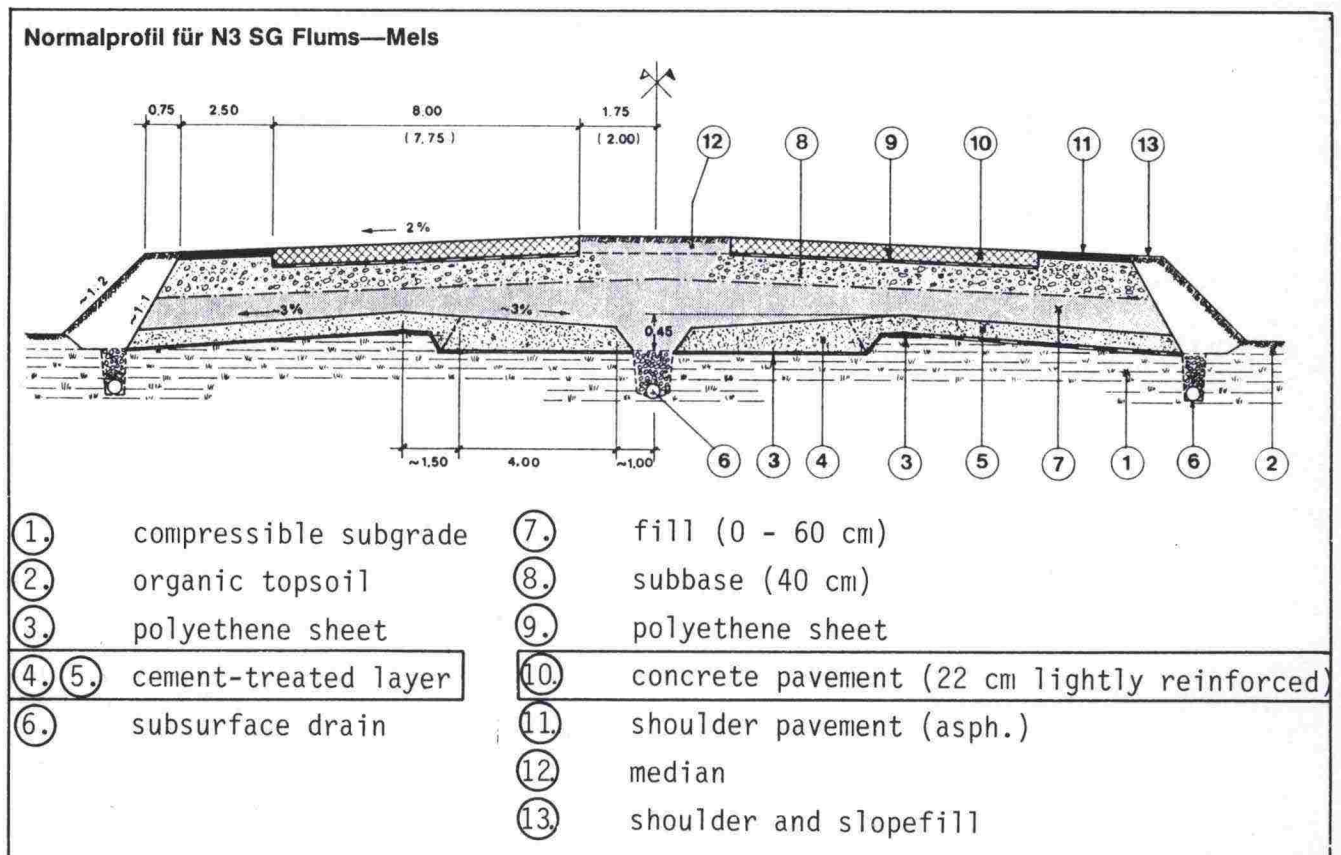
Sandwich structure on a compressible embankment, a Swiss example /9/
